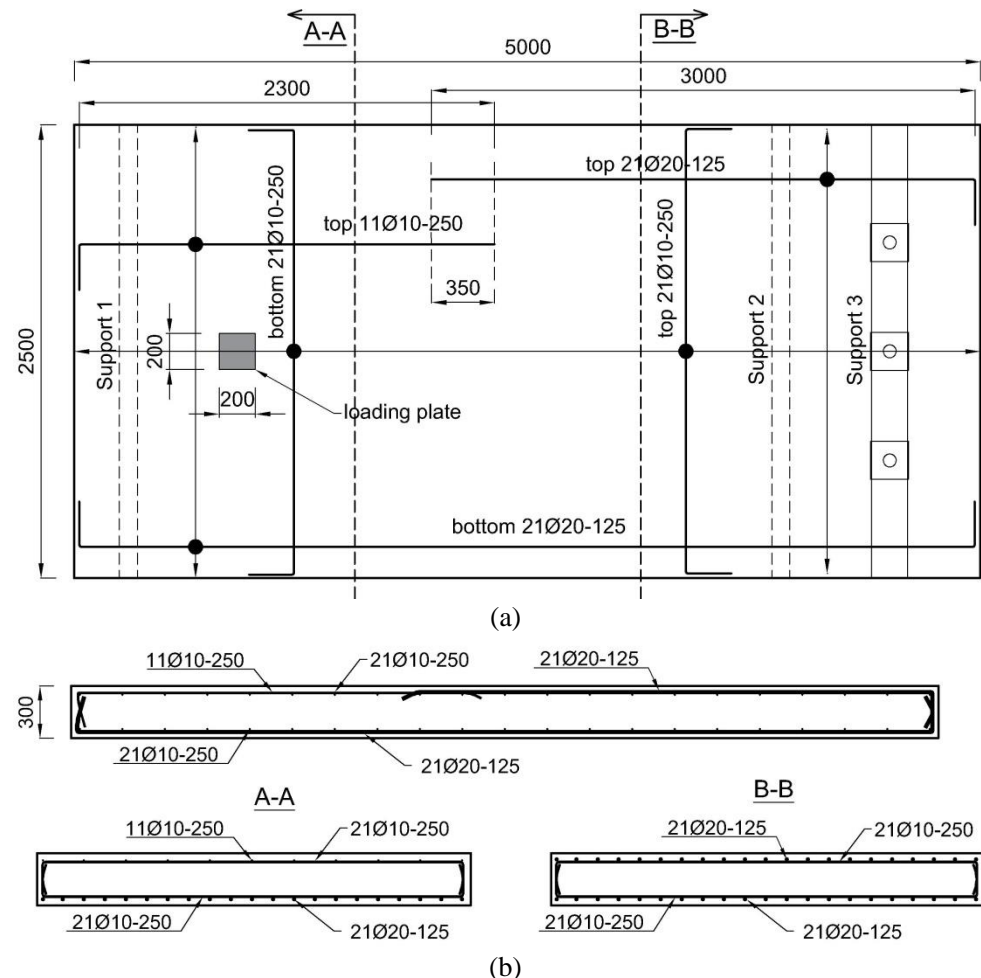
Case RS3. (a) Layout and (b) side views of reinforcement (in mm)
